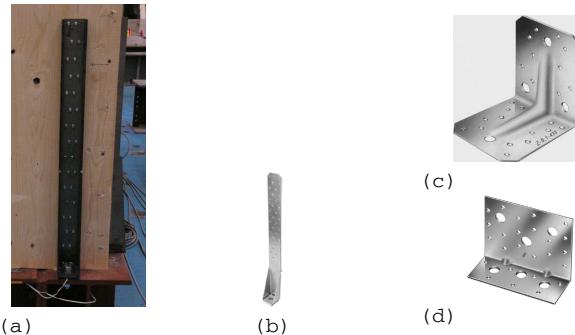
(a) 'IVALSA' anchor of 7-storey-building
